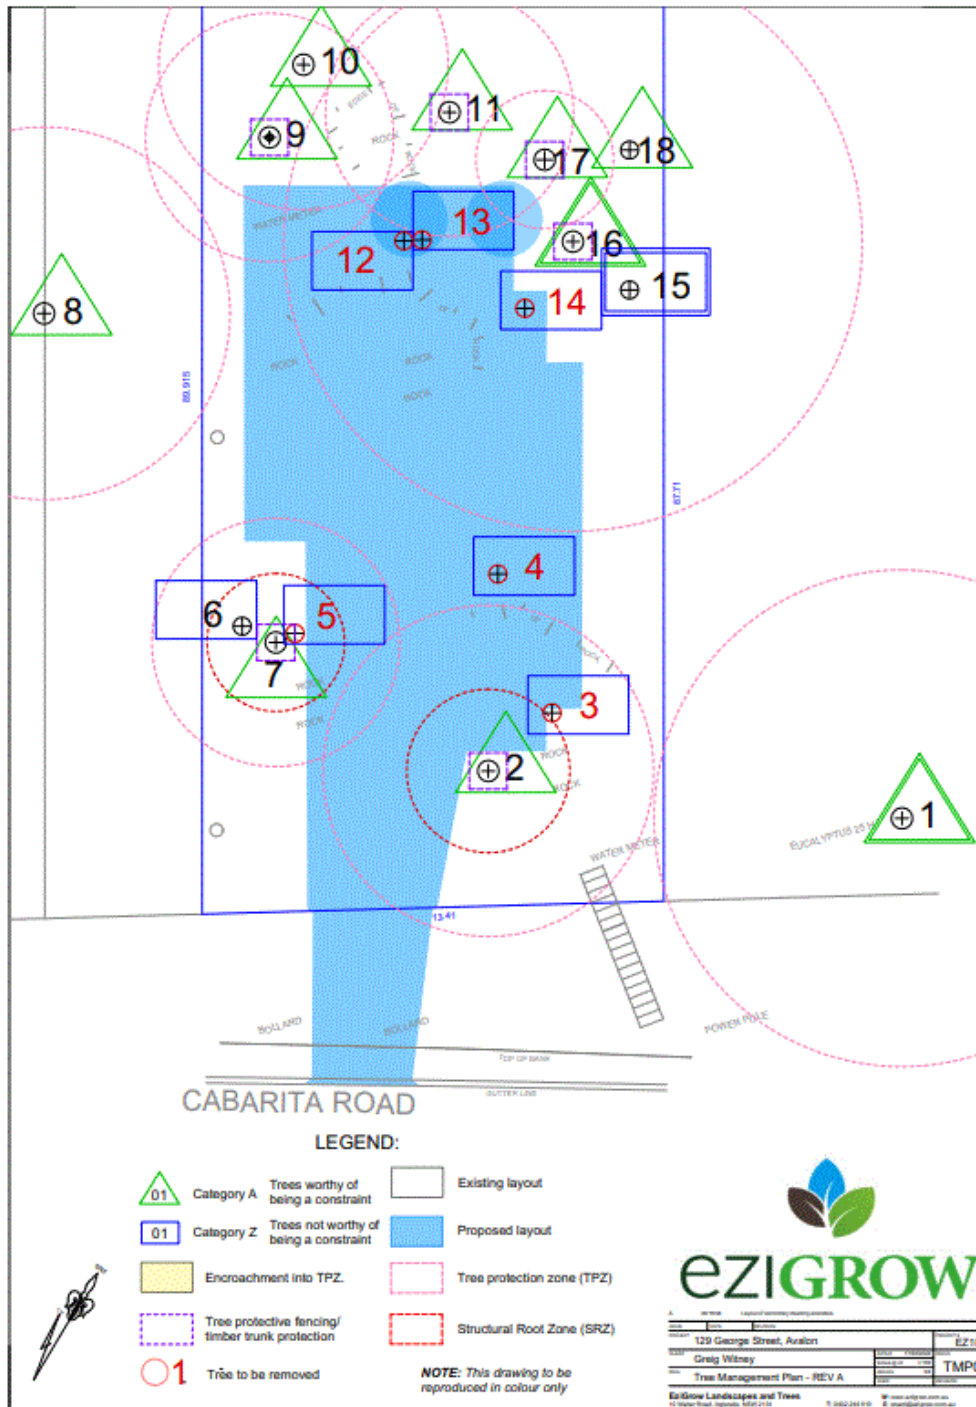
Site Plan representation of building footprint for secondary house at subject address (the proposed potential secondary house footprint shaded in blue); tree numbers with TPZ outlines are also indicated (see Ezigrow 2024 for more detail on tree species and attributes).
